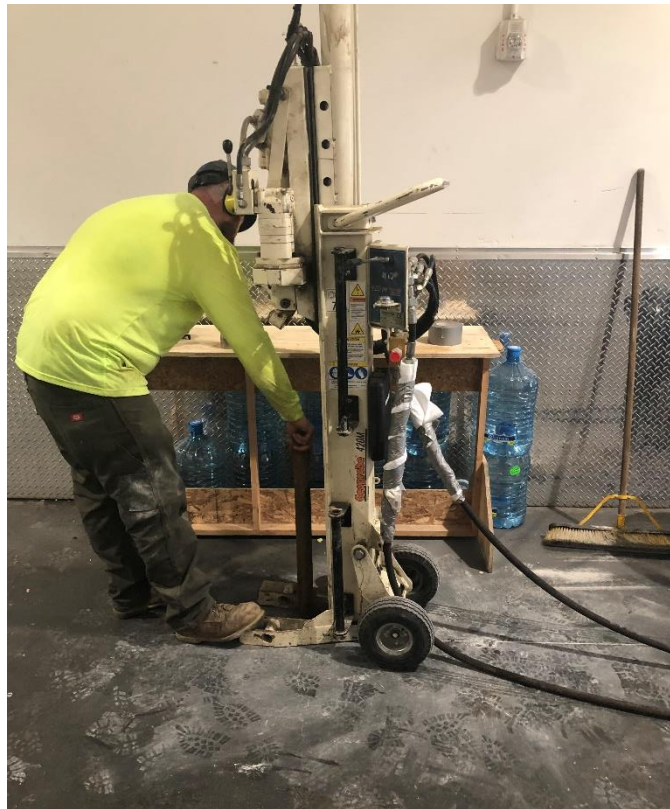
View of installation of SVMF-04A in the central hallway, facing north. Taken on 06/22/2019.
